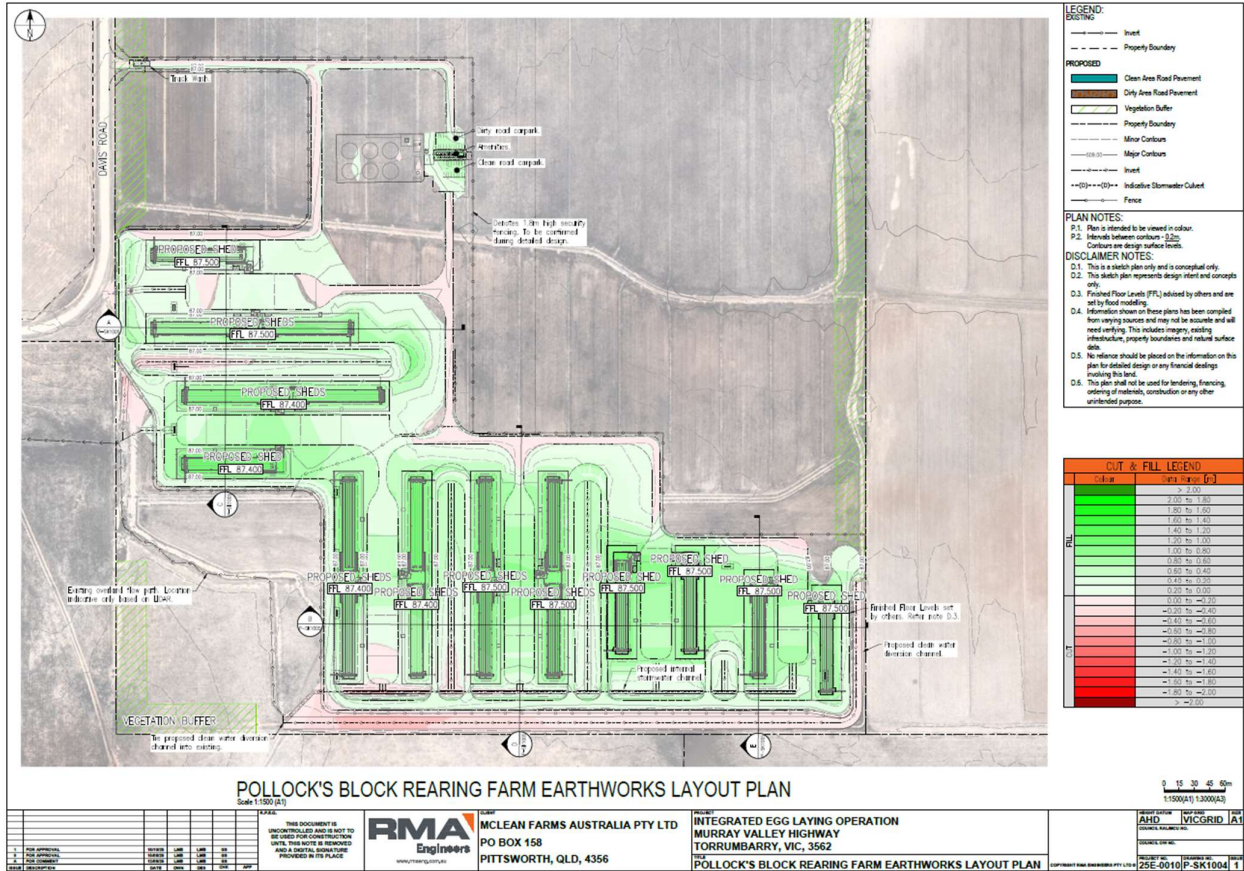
Bulk Earthworks Plan (RMA, 2025)
